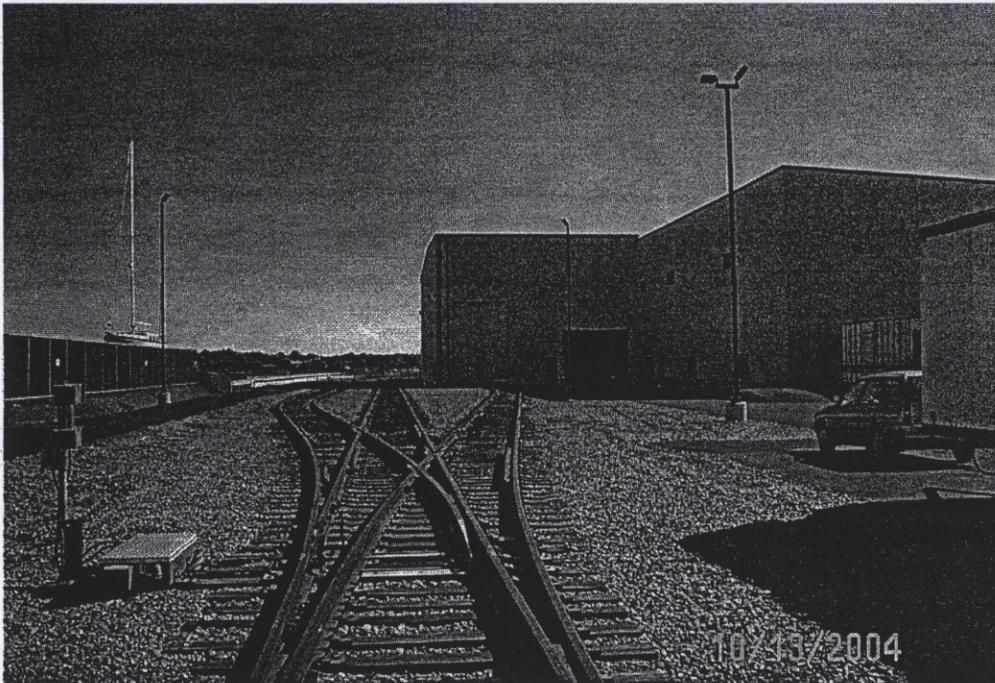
Dewatering building, bulkhead and rail spur, New Bedford Harbor Superfund Site
